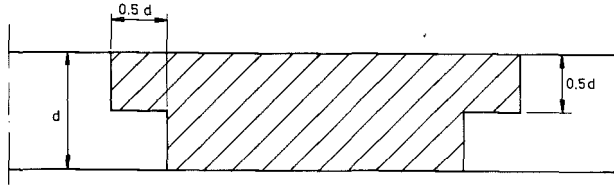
Method of repairing a hole in an asphaltic concrete revetment.
